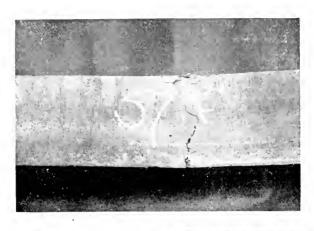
SKETCHES SHOWING BEAMS AFTER FAILURE.
